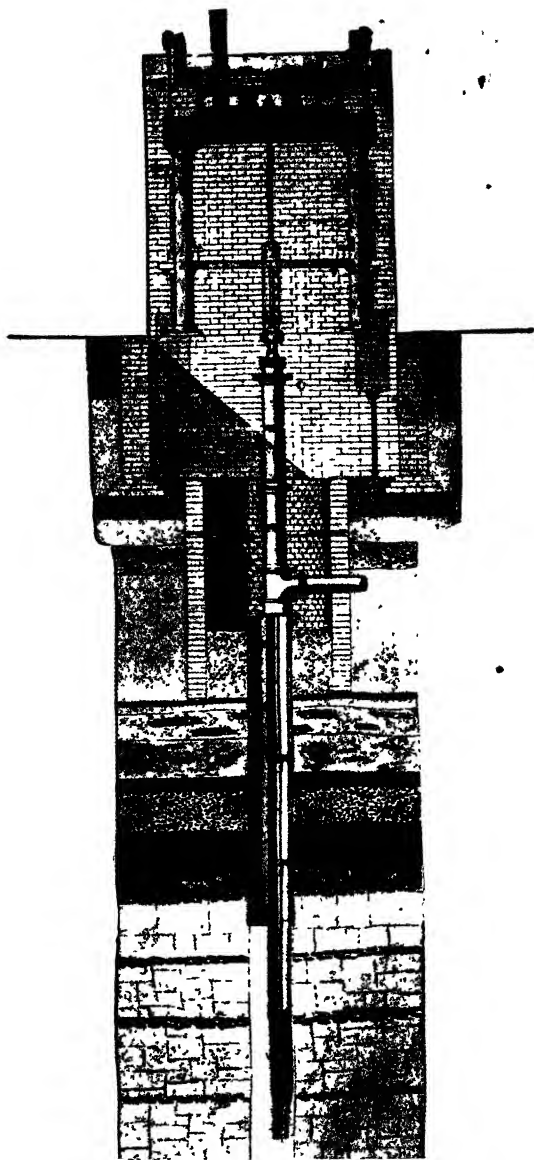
DEEP-WELL PUMP PARTLY FIXED IN AN EXISTING DUG WELL.
